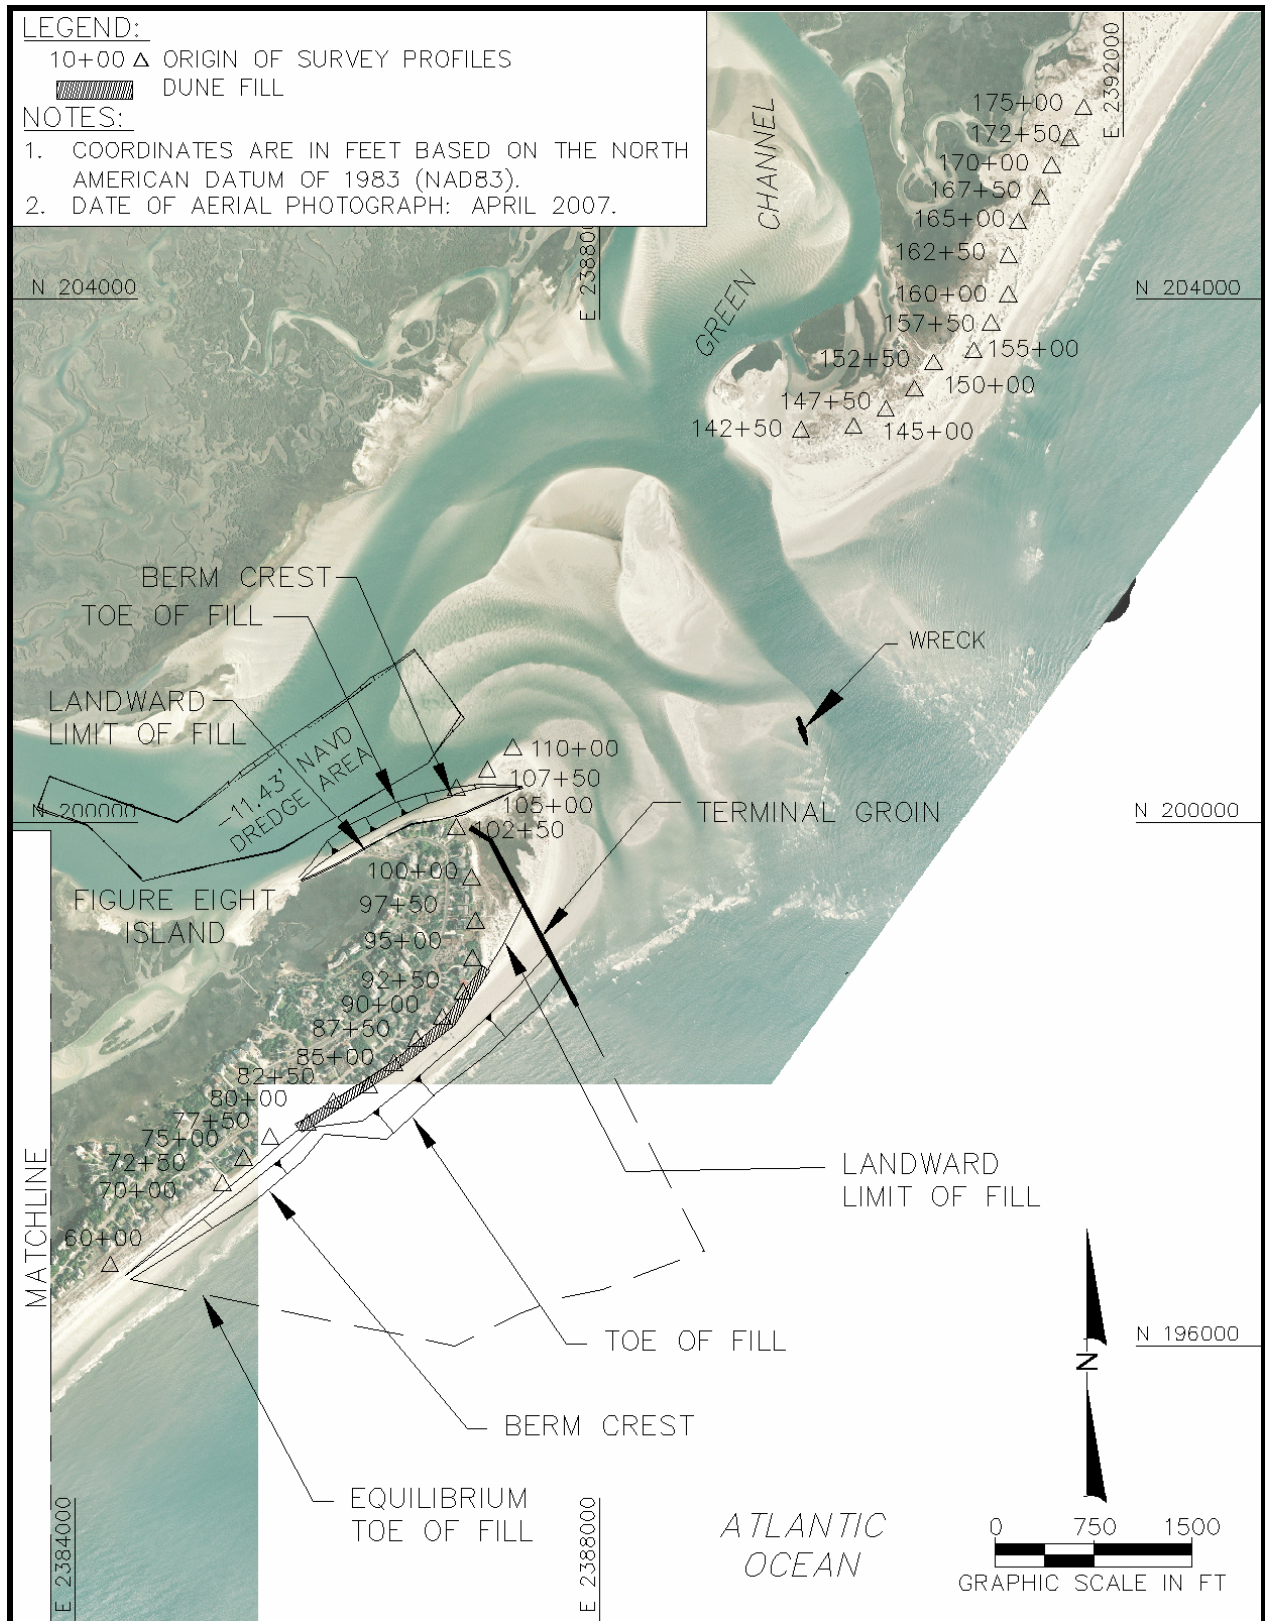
Alternative 5B Dredging and Groin Option and Beach Fill Layout.
